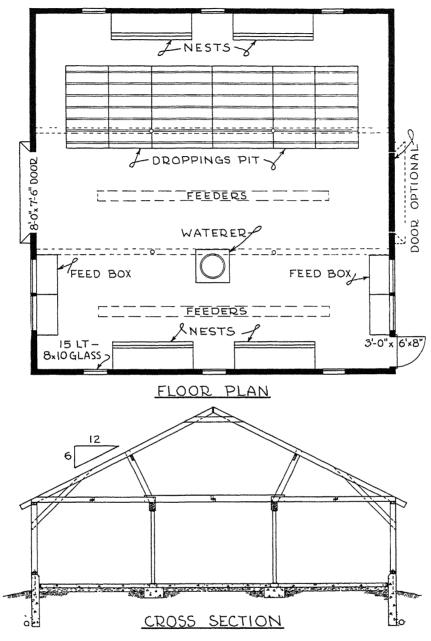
Plan for poultry house from 30 to 40 feet wide for large flocks. It may be built any length desired.
